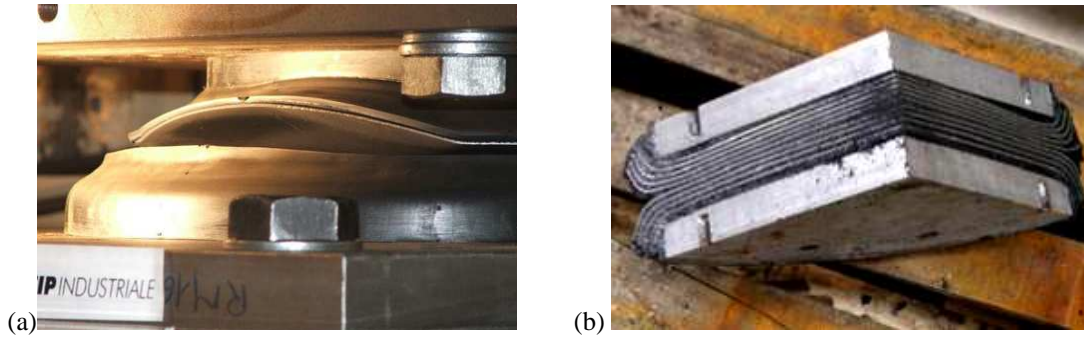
Horizontal (a) and vertical (b) loading HDRB failure tests
